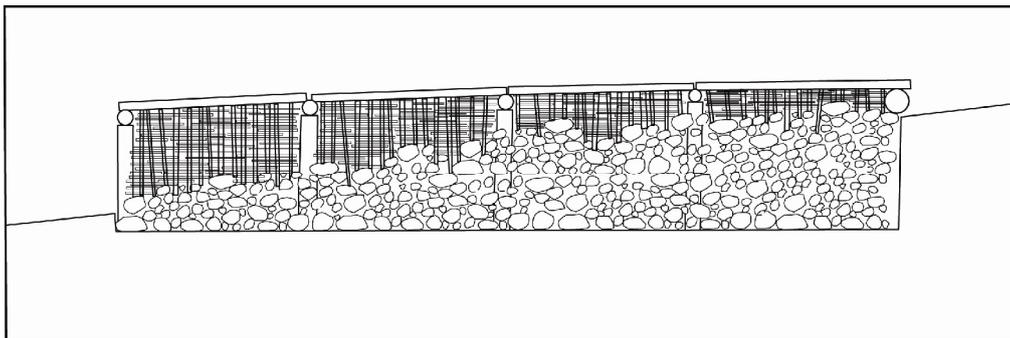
a. View from east- the section of the House D showing the placement of knitted thinner branches to complete the side covers.
